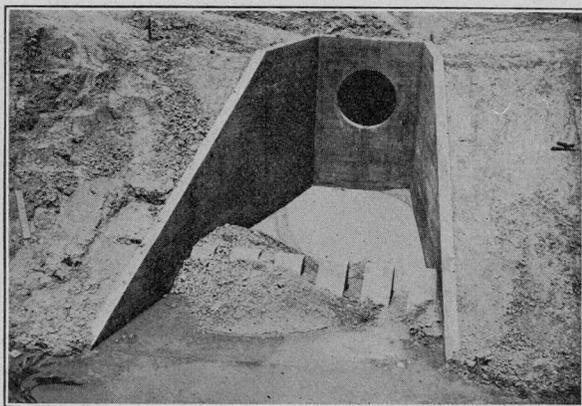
42-INCH OUTFALL SEWER OUTLET WORKS.
